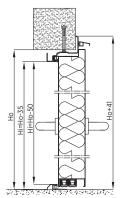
Installation of the ECO Tech single-leaf seamless door with a corner frame without a thermal break to a masonry wall – vertical cross-section
